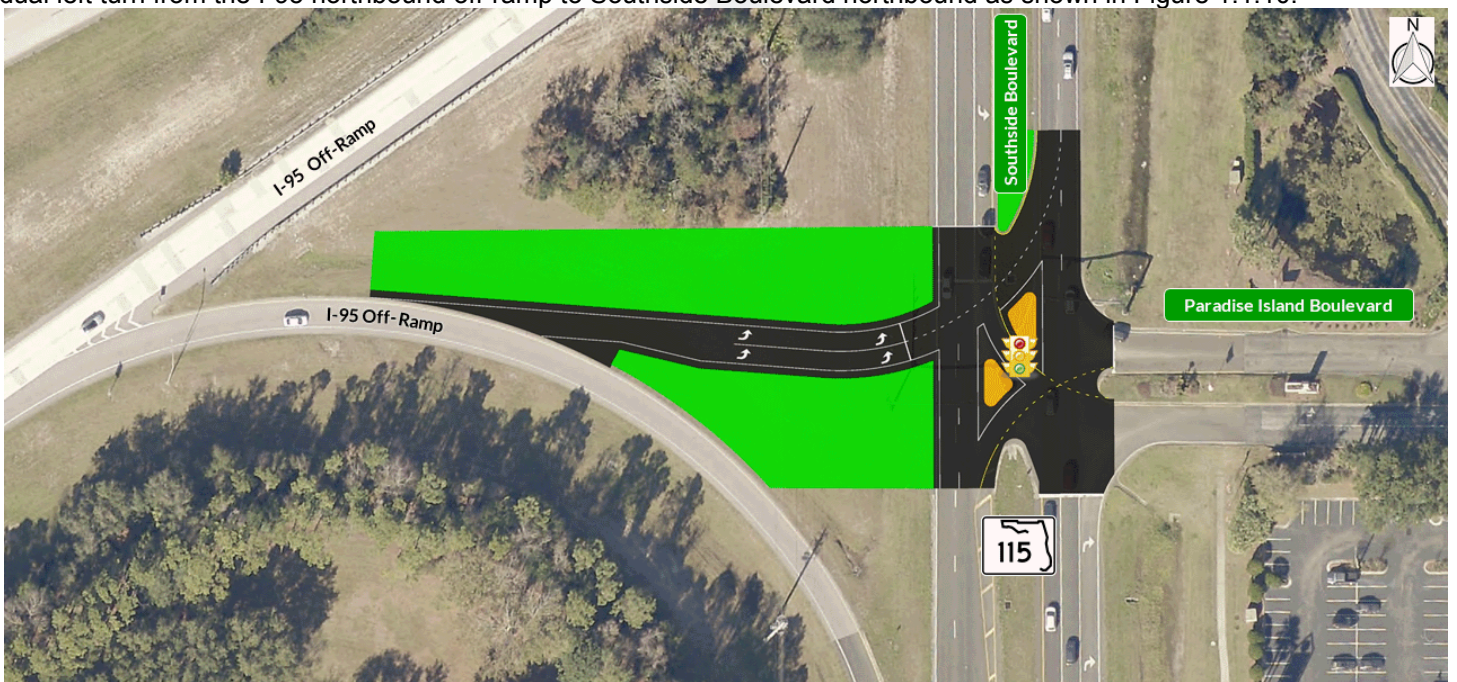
Paradise Island Boulevard Intersection Improvements
